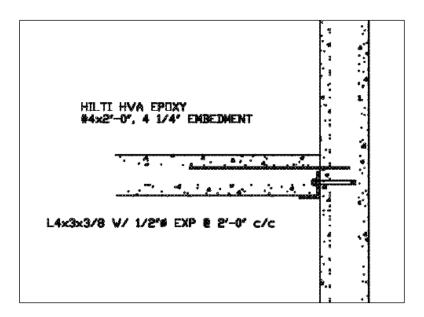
Typical Precast Wall Panel Connection to Floor Slab
